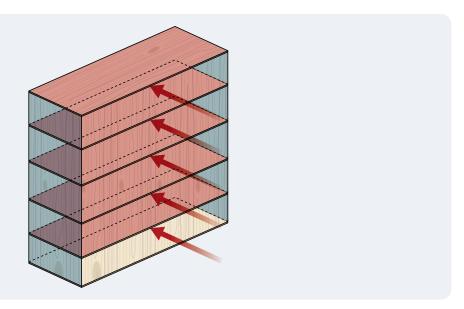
Horizontal diaphragms transferring loads to end bracing.
